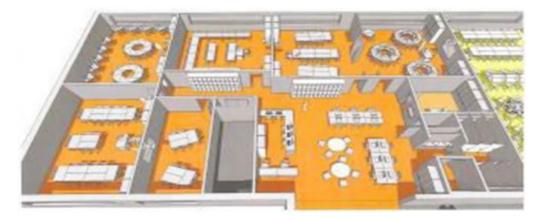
A 3D BIM view of the internal layouts shown to the building end users
